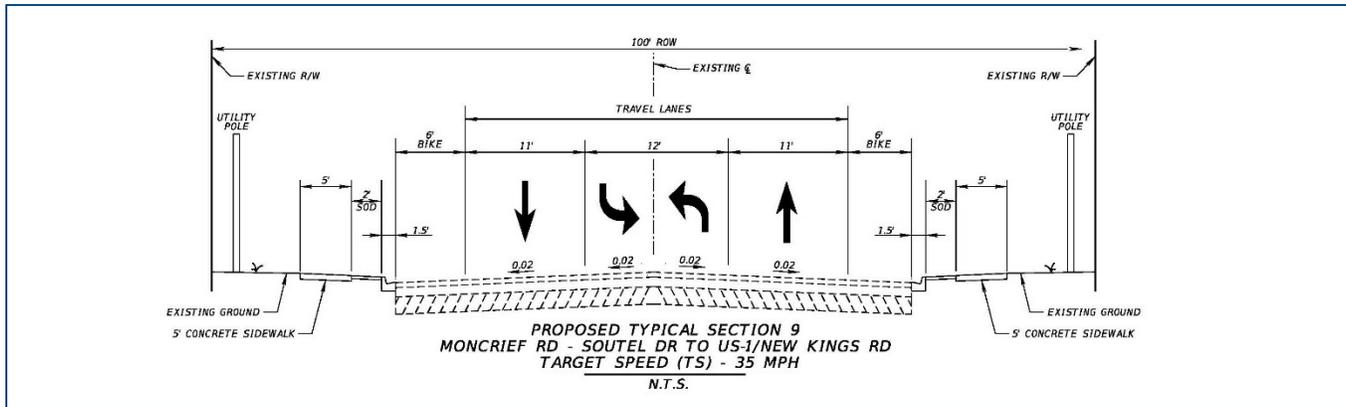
Proposed Typical Section (Soutel Drive to US 1/New Kings Road)
